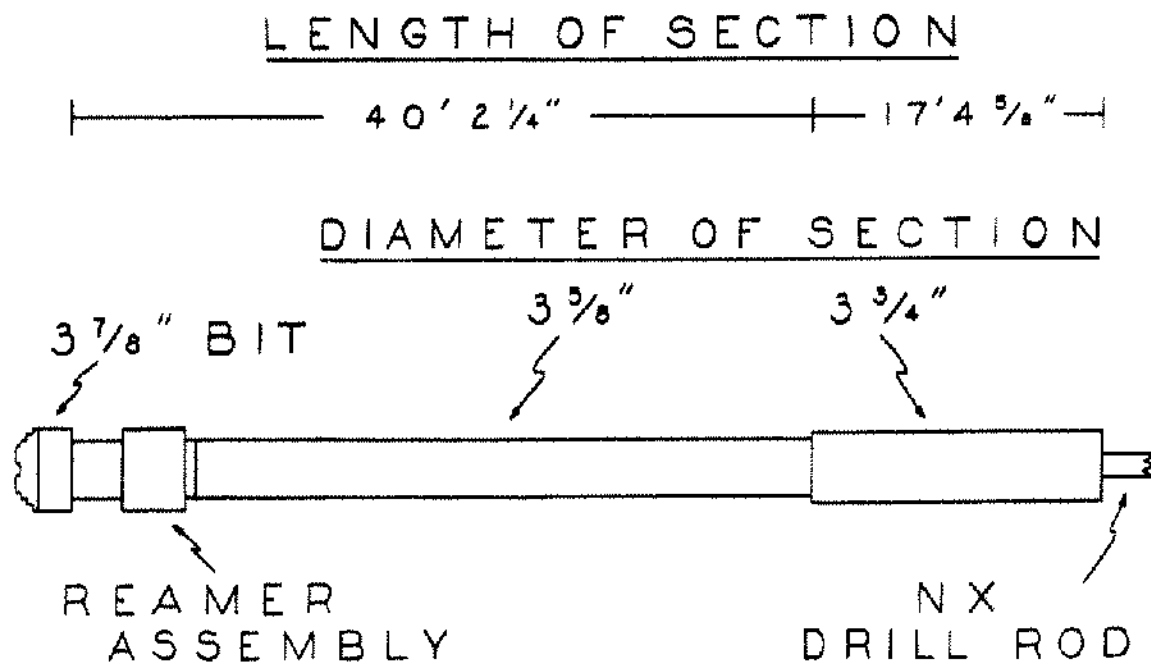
CORE BARREL ASSEMBLY 42' TO 176'
